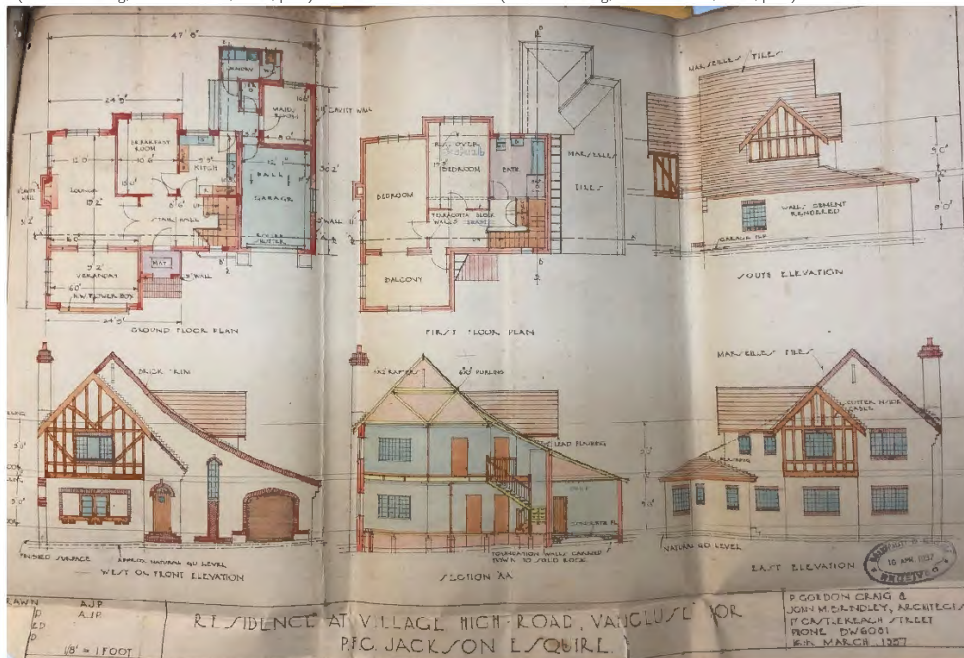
P.F.C. Jackson House, 65 Village High Road, Vaucluse, 1937. Architect: P. Gordon Craig & John M. Brindley (Source: BA 50/1937, Woollahra Municipal Council)
